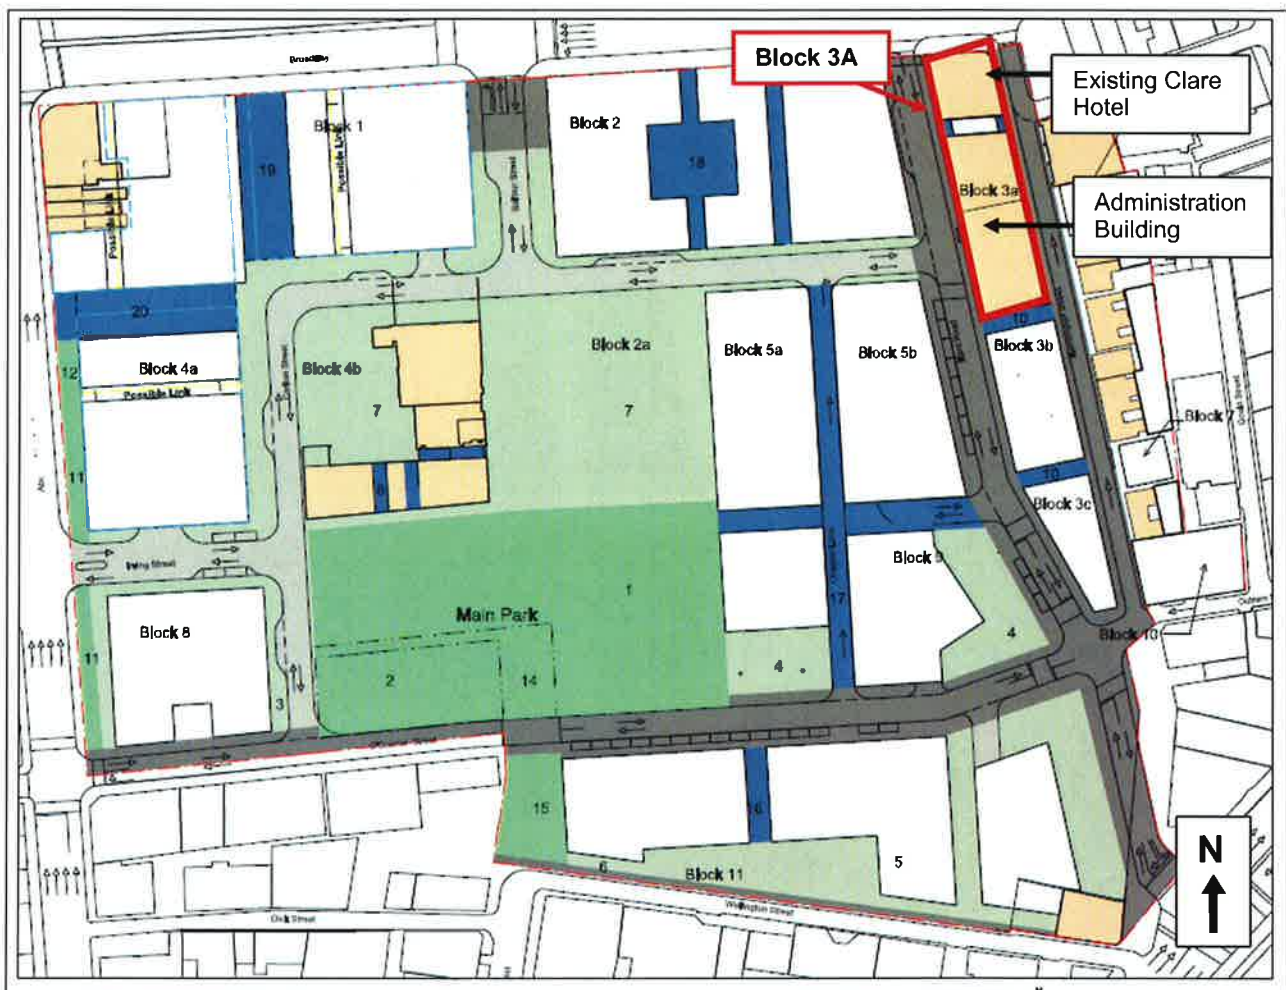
Central Park approved Concept Plan site layout and Block 3A location
